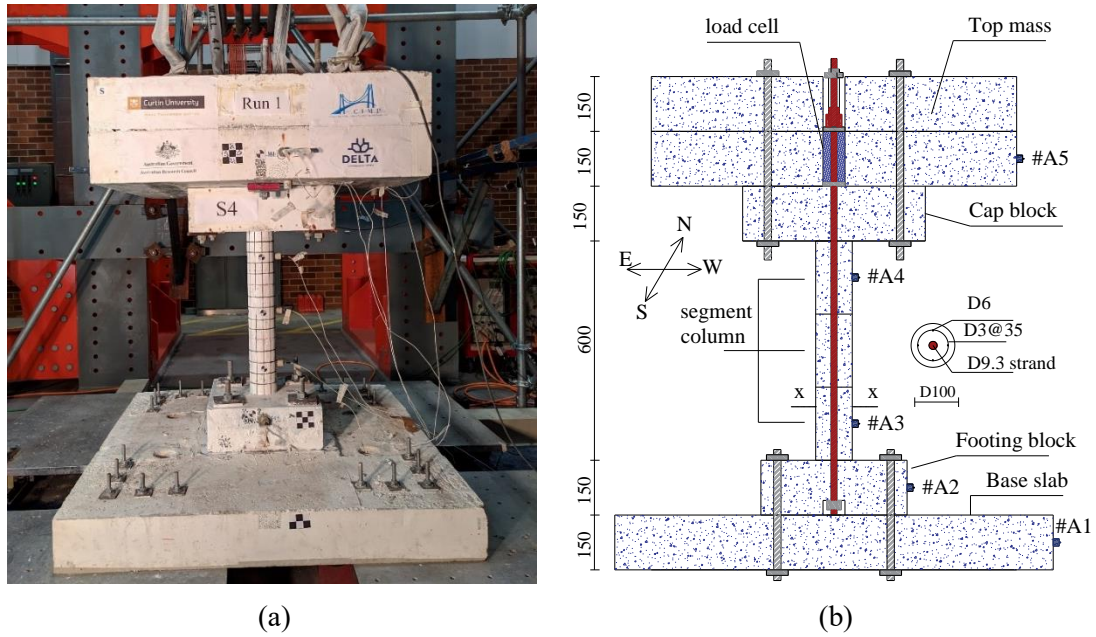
The experimental setup for shake table tests of precast segmental column reinforced with FRP bars (Specimen 1): (a) overall view and (b) schematic diagram. (unit: mm).
